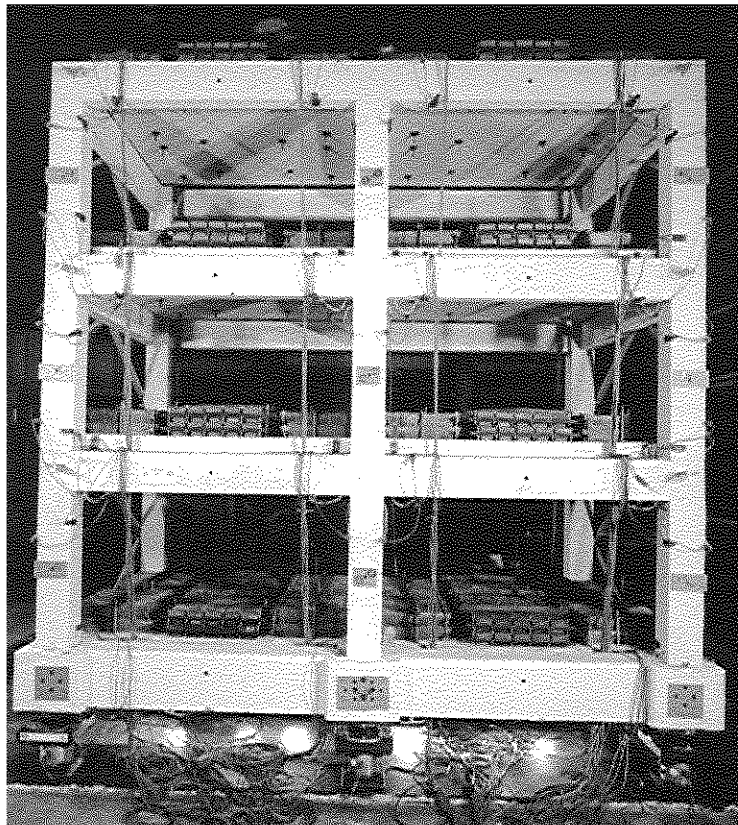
1/2.5-Scale Model of Isolated Building on Shake Table
